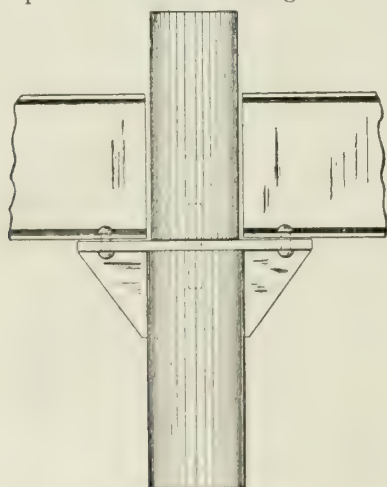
STEEL BRACKET AND BEAM SUPPORT
